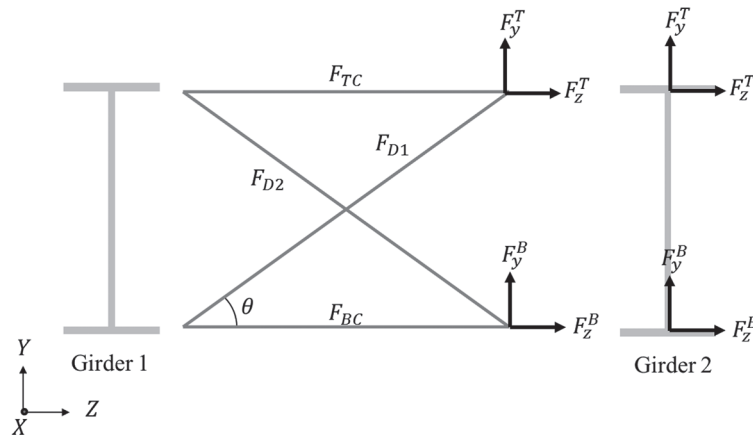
Fit-up forces by resolving cross-frame forces at connection points.
